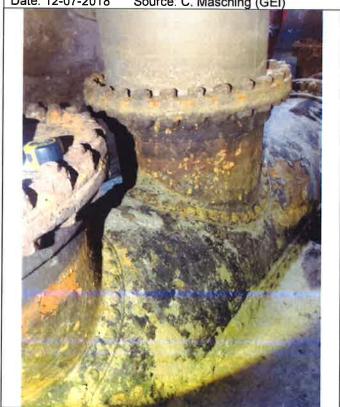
Bottom of fabricated 30-inch x 16-inch tee with concrete fill to spring line.
